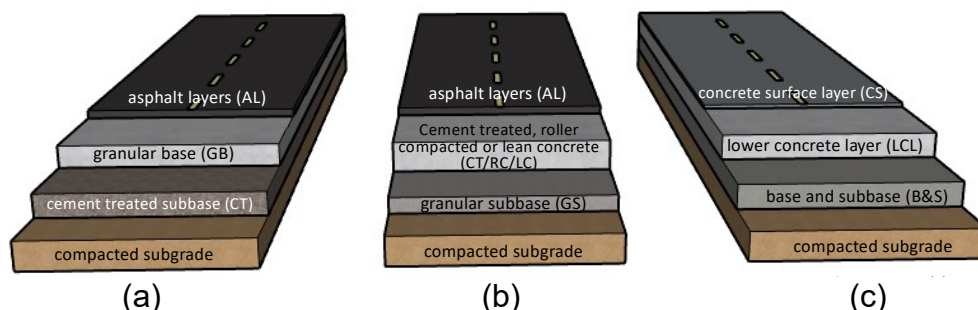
Typical cross-section of pavements (a) flexible, (b) semi-rigid and (c) rigid pavements. Modified from Plati (2019)
